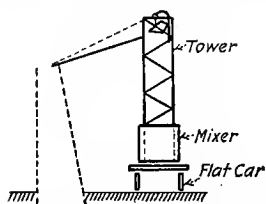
Pouring concrete by tower and mixer mounted on flat car.
